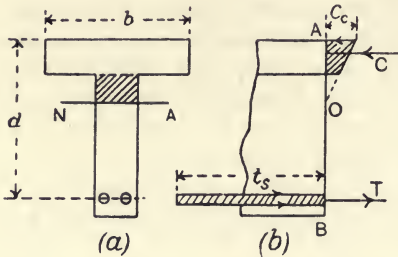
Reinforced concrete T beam, NA below the slab.
